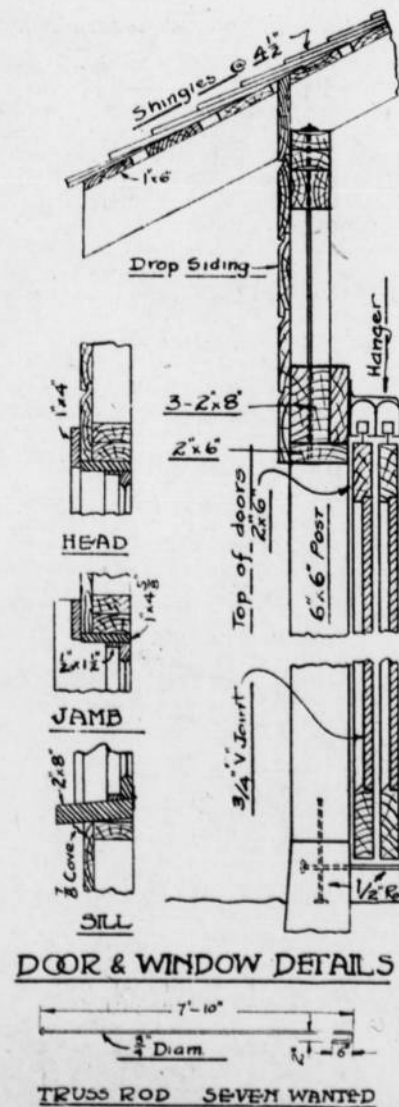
Detail showing Framing at Doors and Windows; also Rod for Large Truss.
